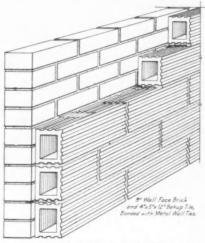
Most Simple Type of Brick and Tile Wall with Metal Tie Bond for 9-Inch Wall.
